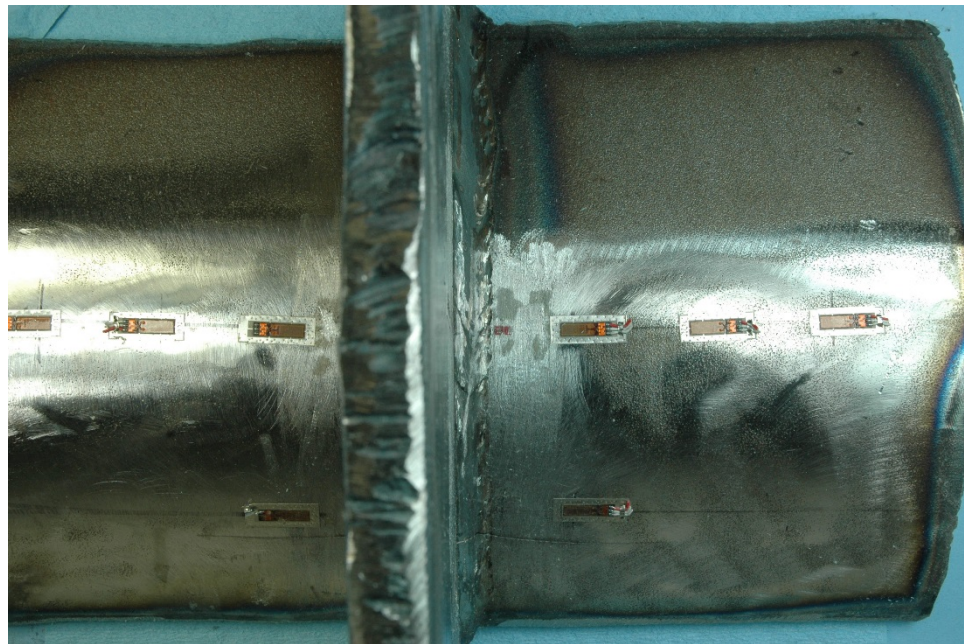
Portion of rib and floor beam containing the north side crack cut out of the mock-up specimen MU3
